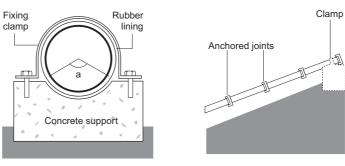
Pipe laying on a concrete support (Pont-a-Mousson, 1992).
